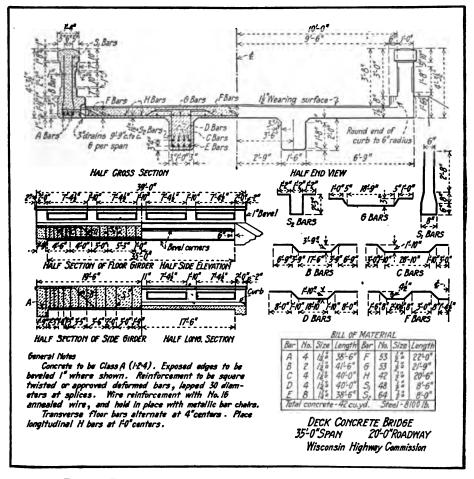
REINFORCED CONCRETE THROUGH-DECK GIRDER BRIDGE.
